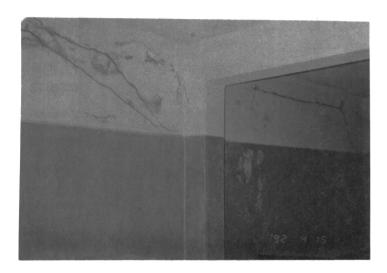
Example of Left Walls from the Underlying Support at the Basement of Main Building.
